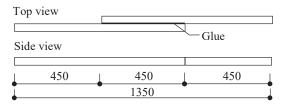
Piled beams which were shortened their bonded zone in half; Specimen 4
